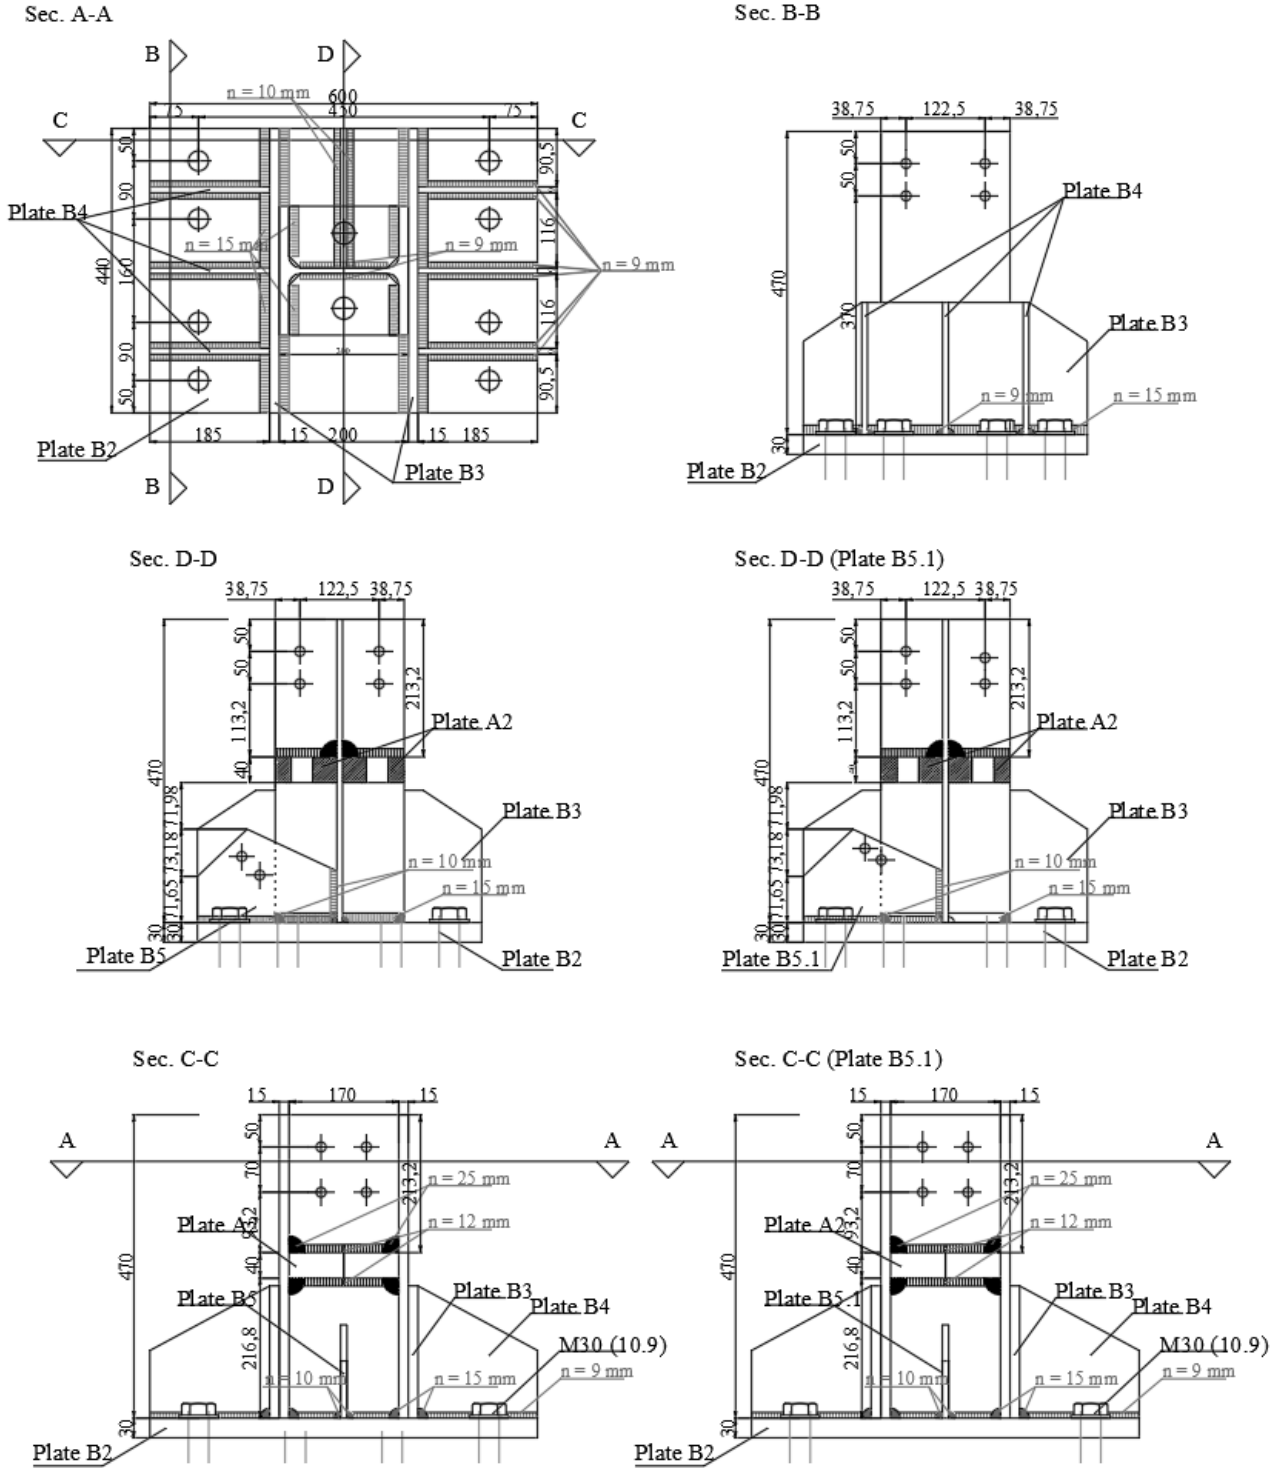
Lower part of the SC-CB (dimensions in mm)
